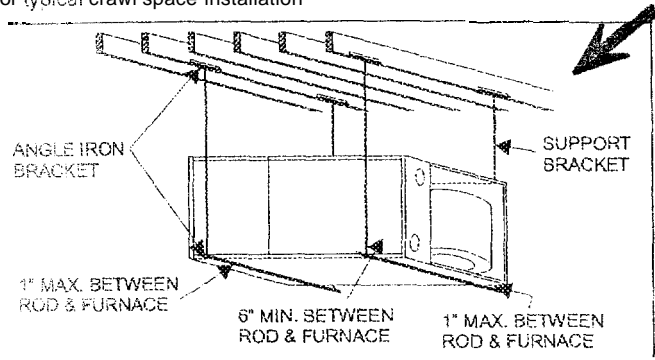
Typical Suspended Furnace / Crawl Space Installation
